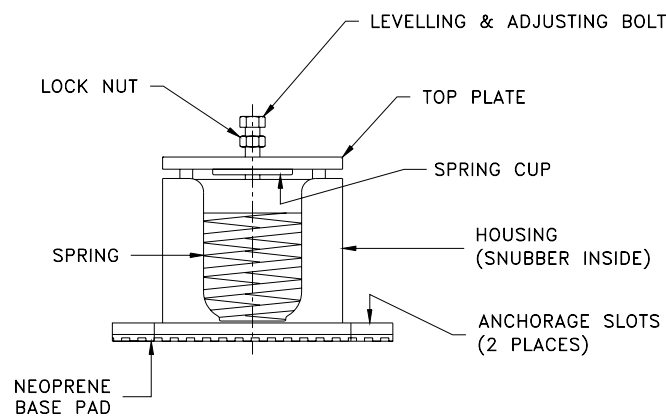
Floor Mounted Vibration Isolators – (Typical)
